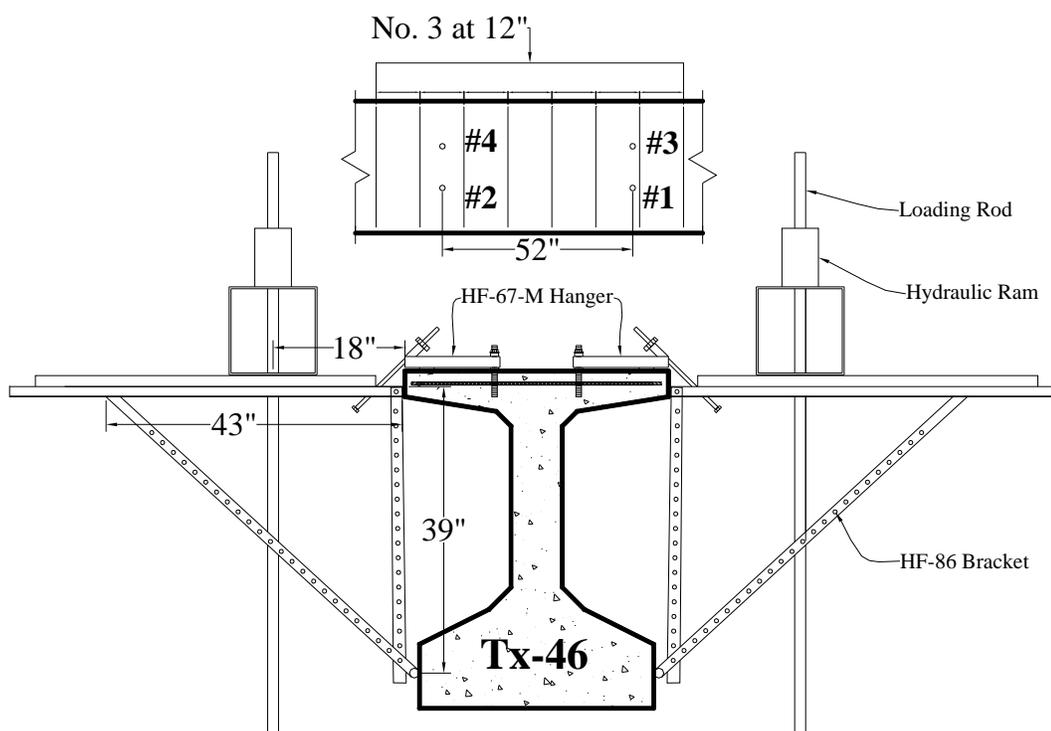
Reinforcement pattern and loading geometry for HF-67-M on Tx-46
